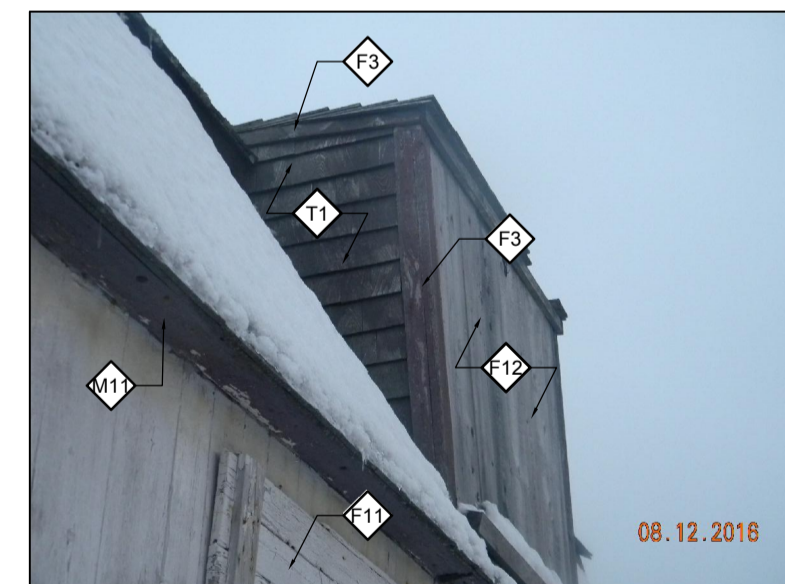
DETERIORATED SOFFIT BOARD TO REPLACE AND EXTERIOR SURFACE OF THE WINDOW DORMER
